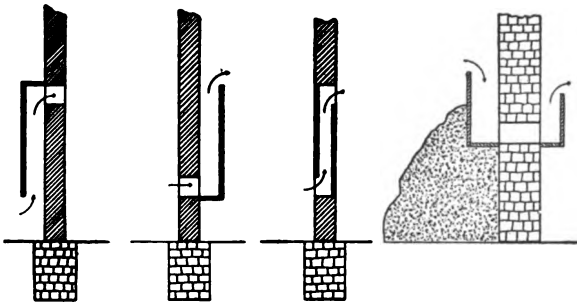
Modes of admitting air into a stable. That at the right shows a basement wall.
